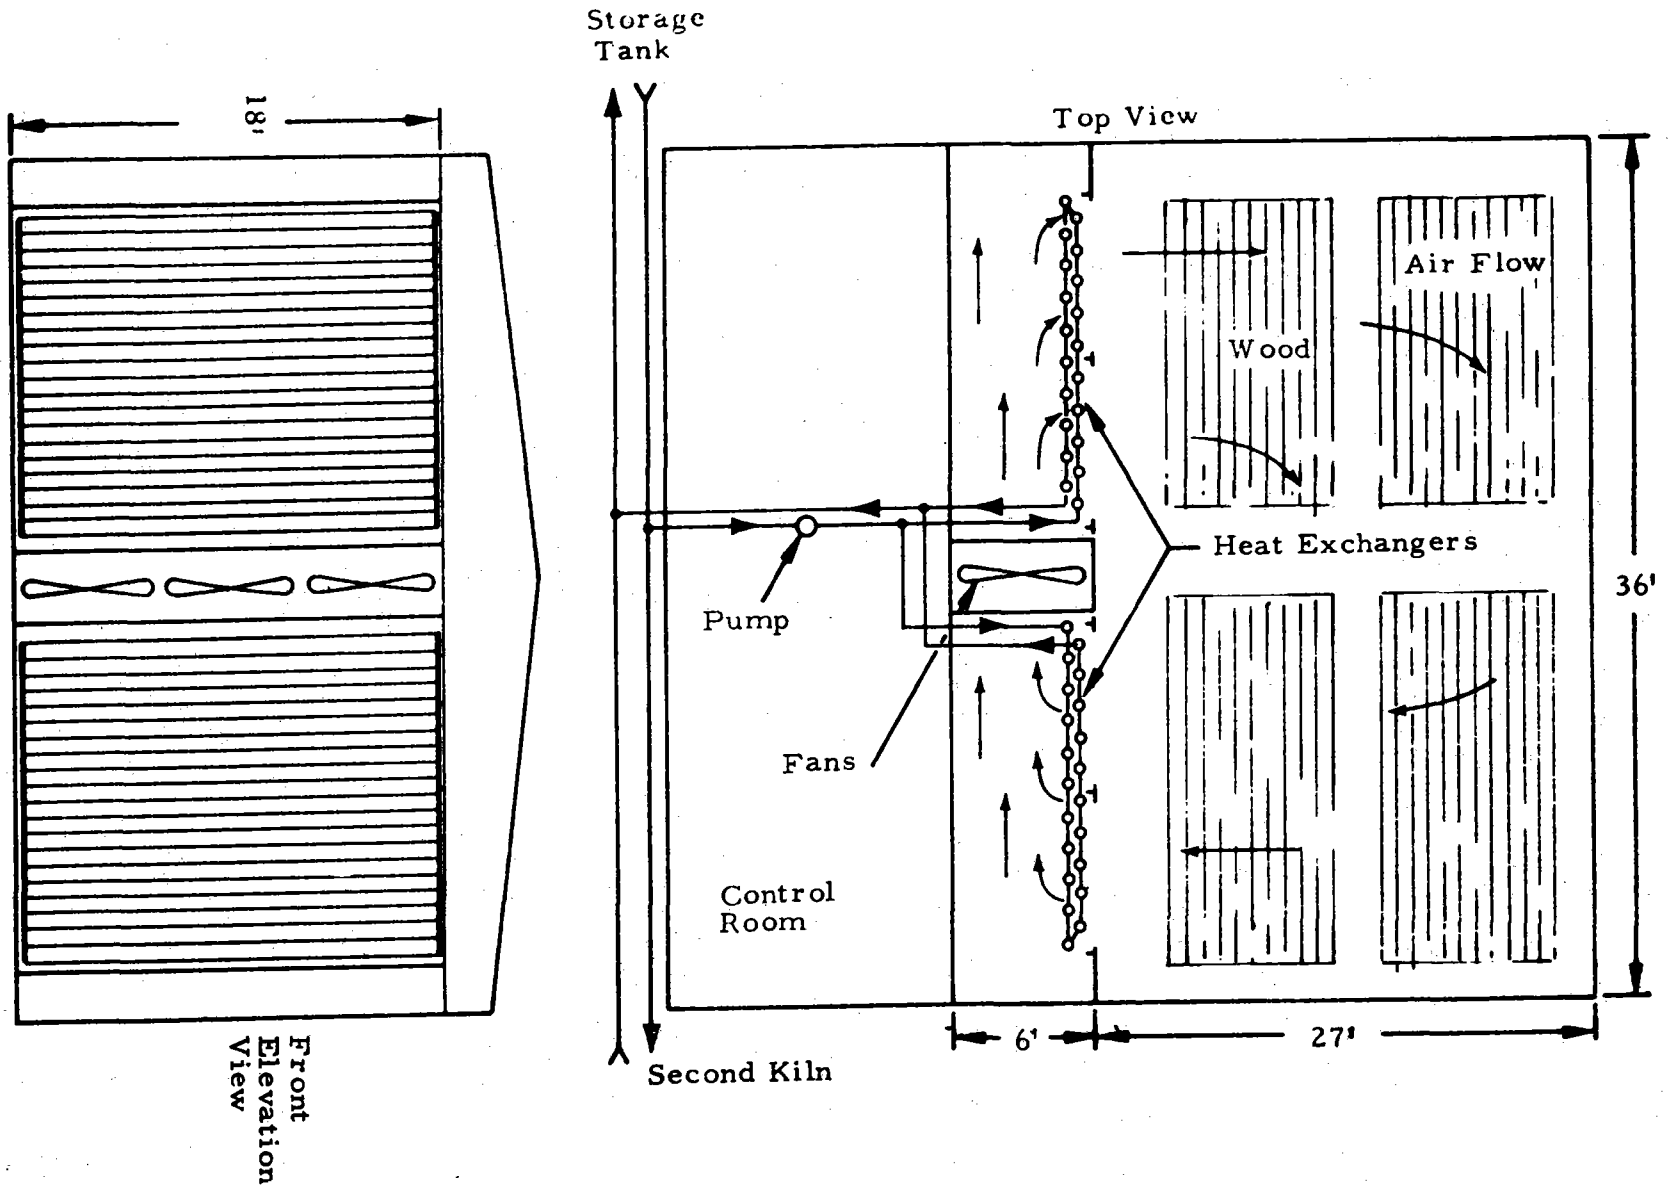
Schematic of Heat Exchanger Installation in Kiln
